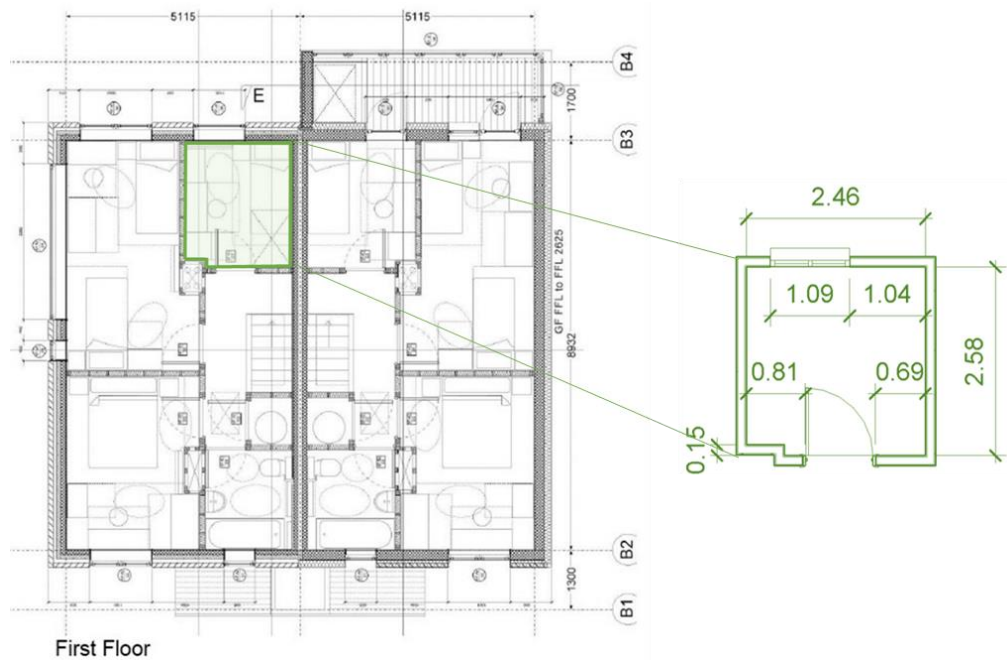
First floor layout measurements, (The University of Nottingham).
